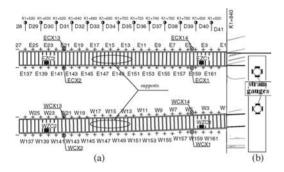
General layout of monitoring points: (a) The south section of the excavations; (b) The strain gauges welded around the support.
